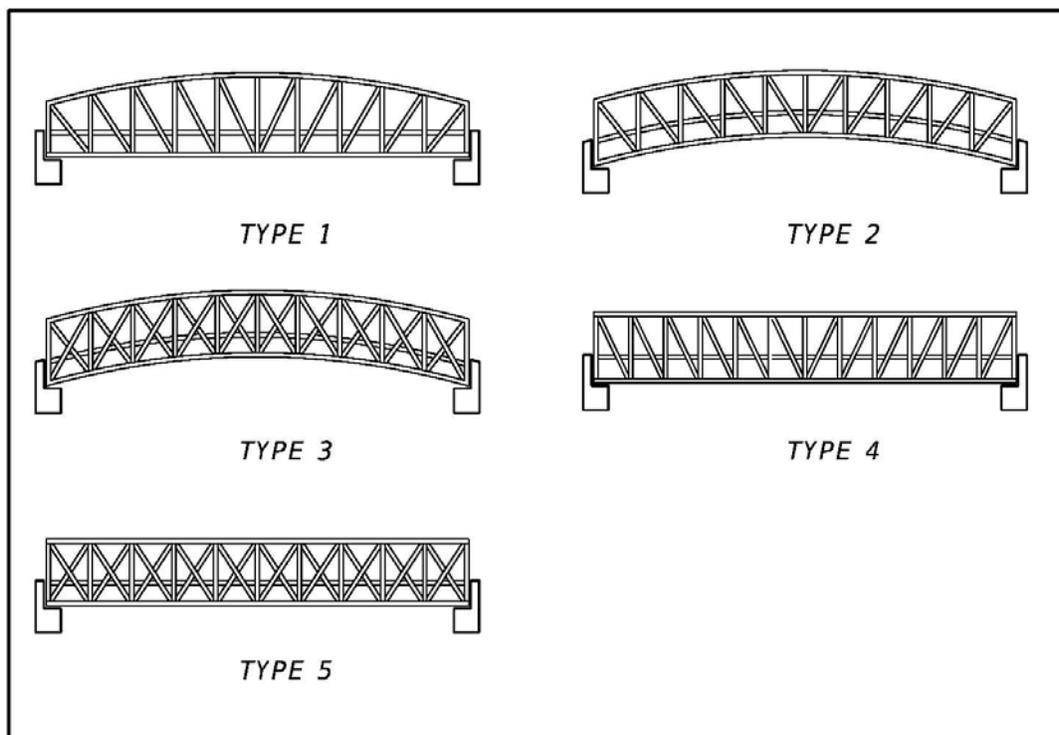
Prefabricated Pedestrian Bridge Standard Truss Member Shapes
